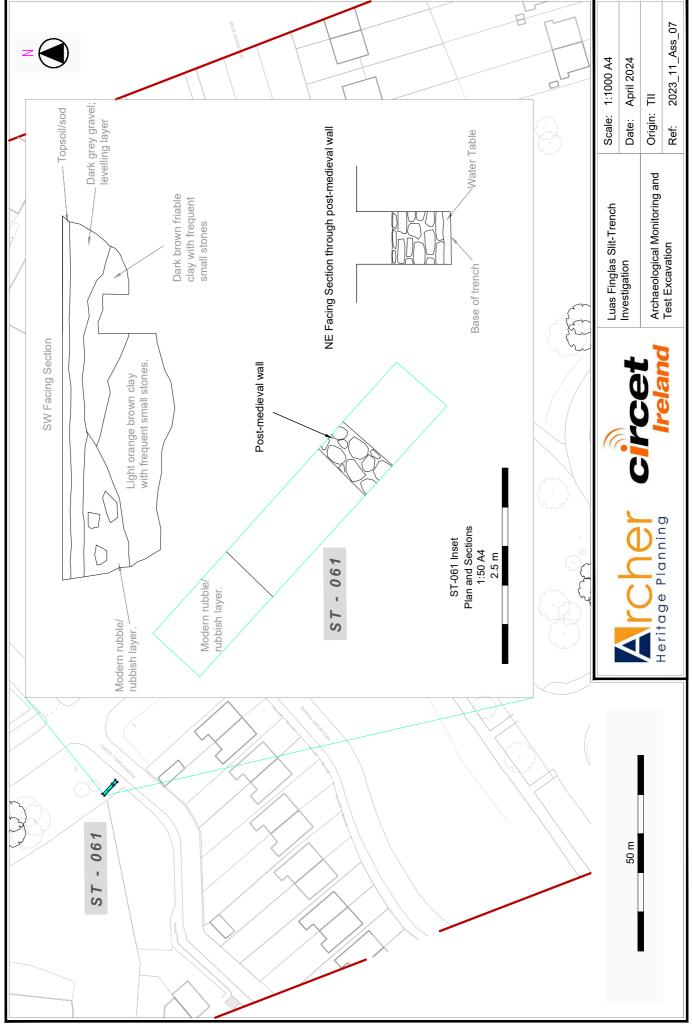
Detailed Utility Slit Trench Location Plan (v)
